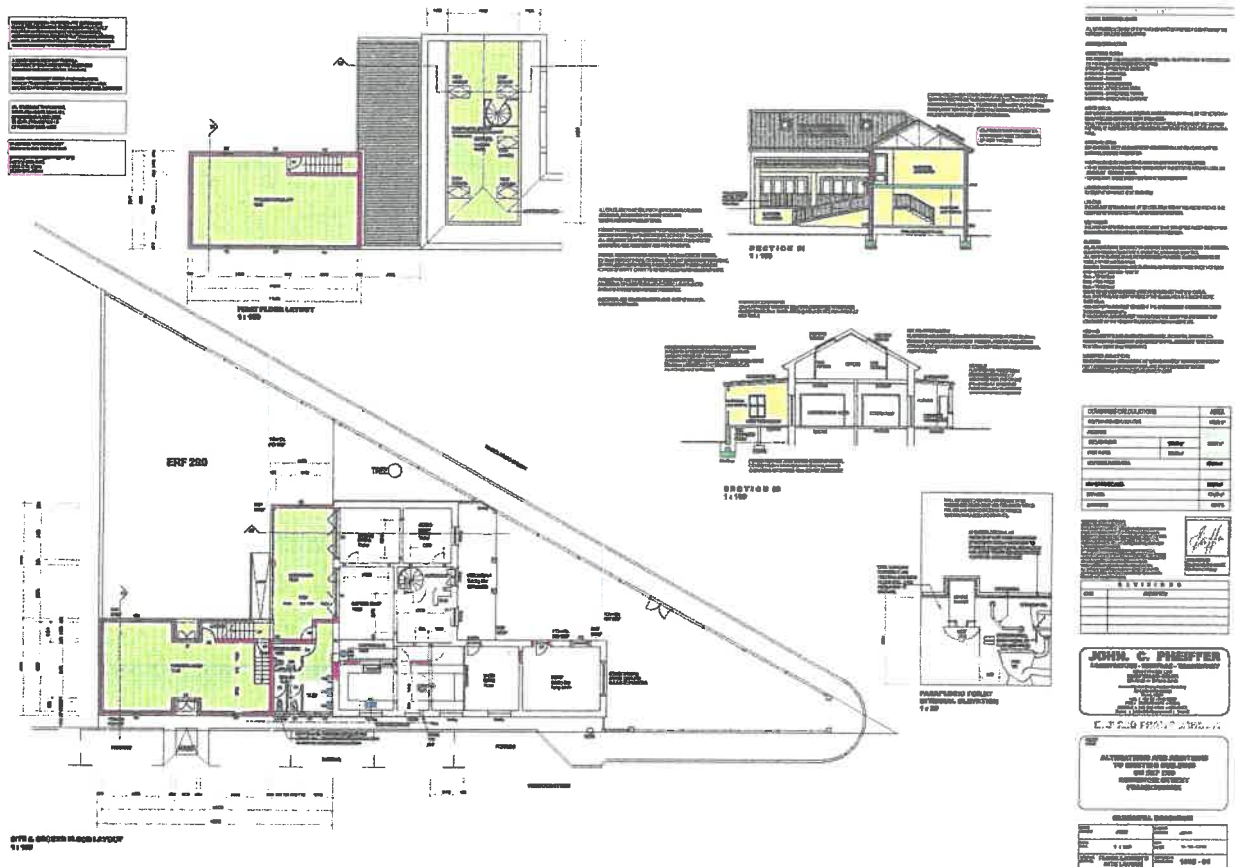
LATEST BUILDING PLAN FOR EXISTING & PROPOSED STRUCTURES ON ERF 230 FRANSCHHOEK
